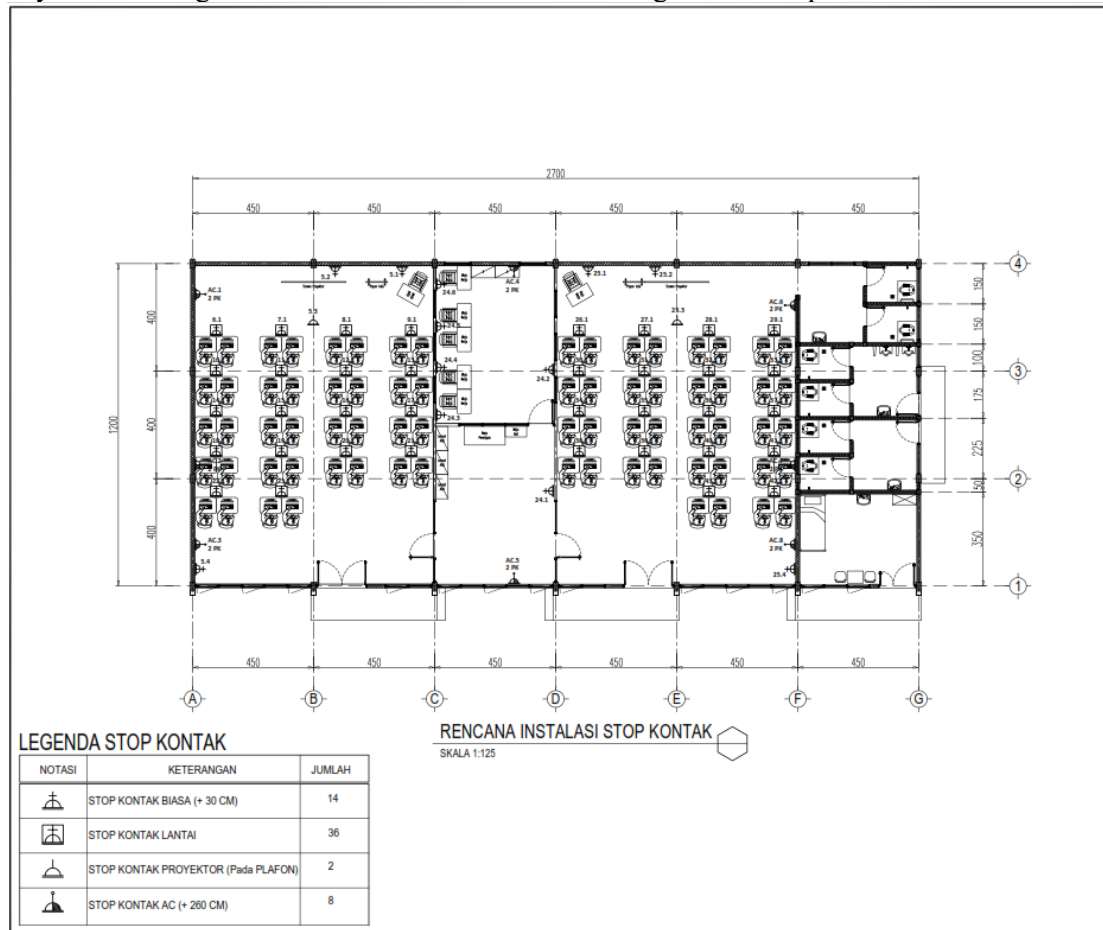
Electrical Installation and Power Outlet Plan for the DPIB Laboratory
